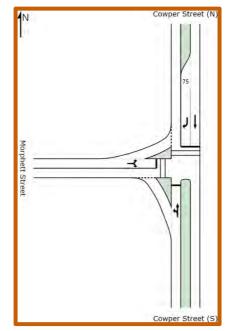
Recommended Layout for the Intersection of Morphett Street and Cowper Street
